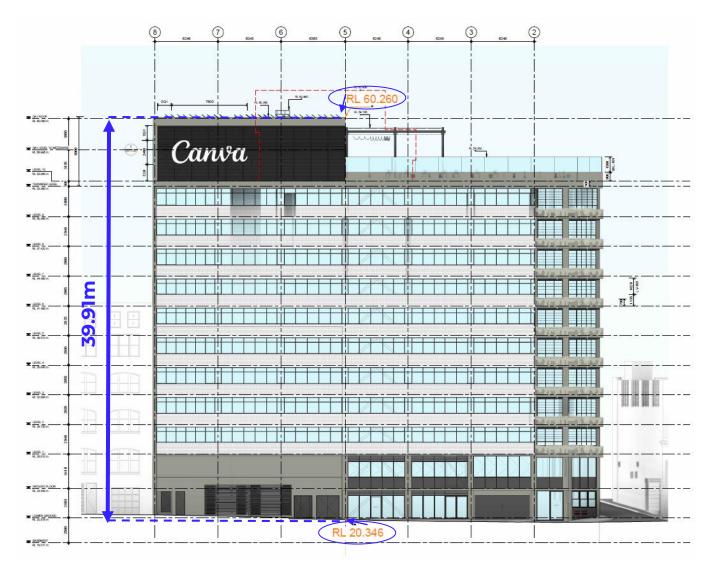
Proposed Height of Building (at maximum height extent) at the northern elevation/Sophia Street)
